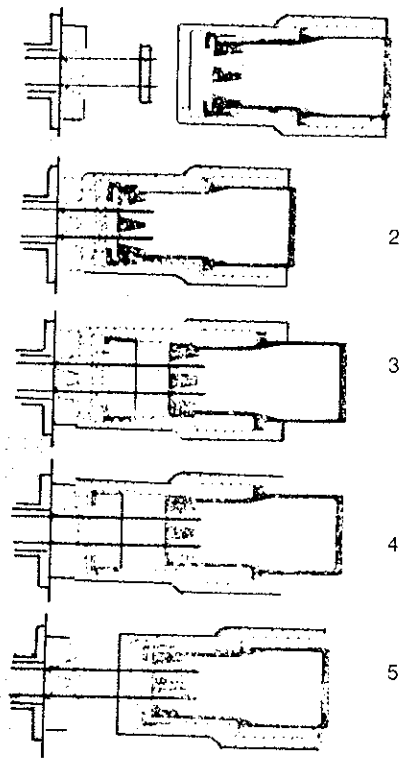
Prestressing of anchors inside the hollow cylinder
